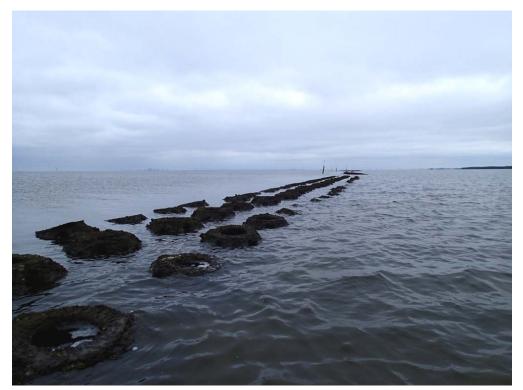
Photostation 2 east of Bar 4 (Reef Balls), facing west-northwest (10/09/2013)
